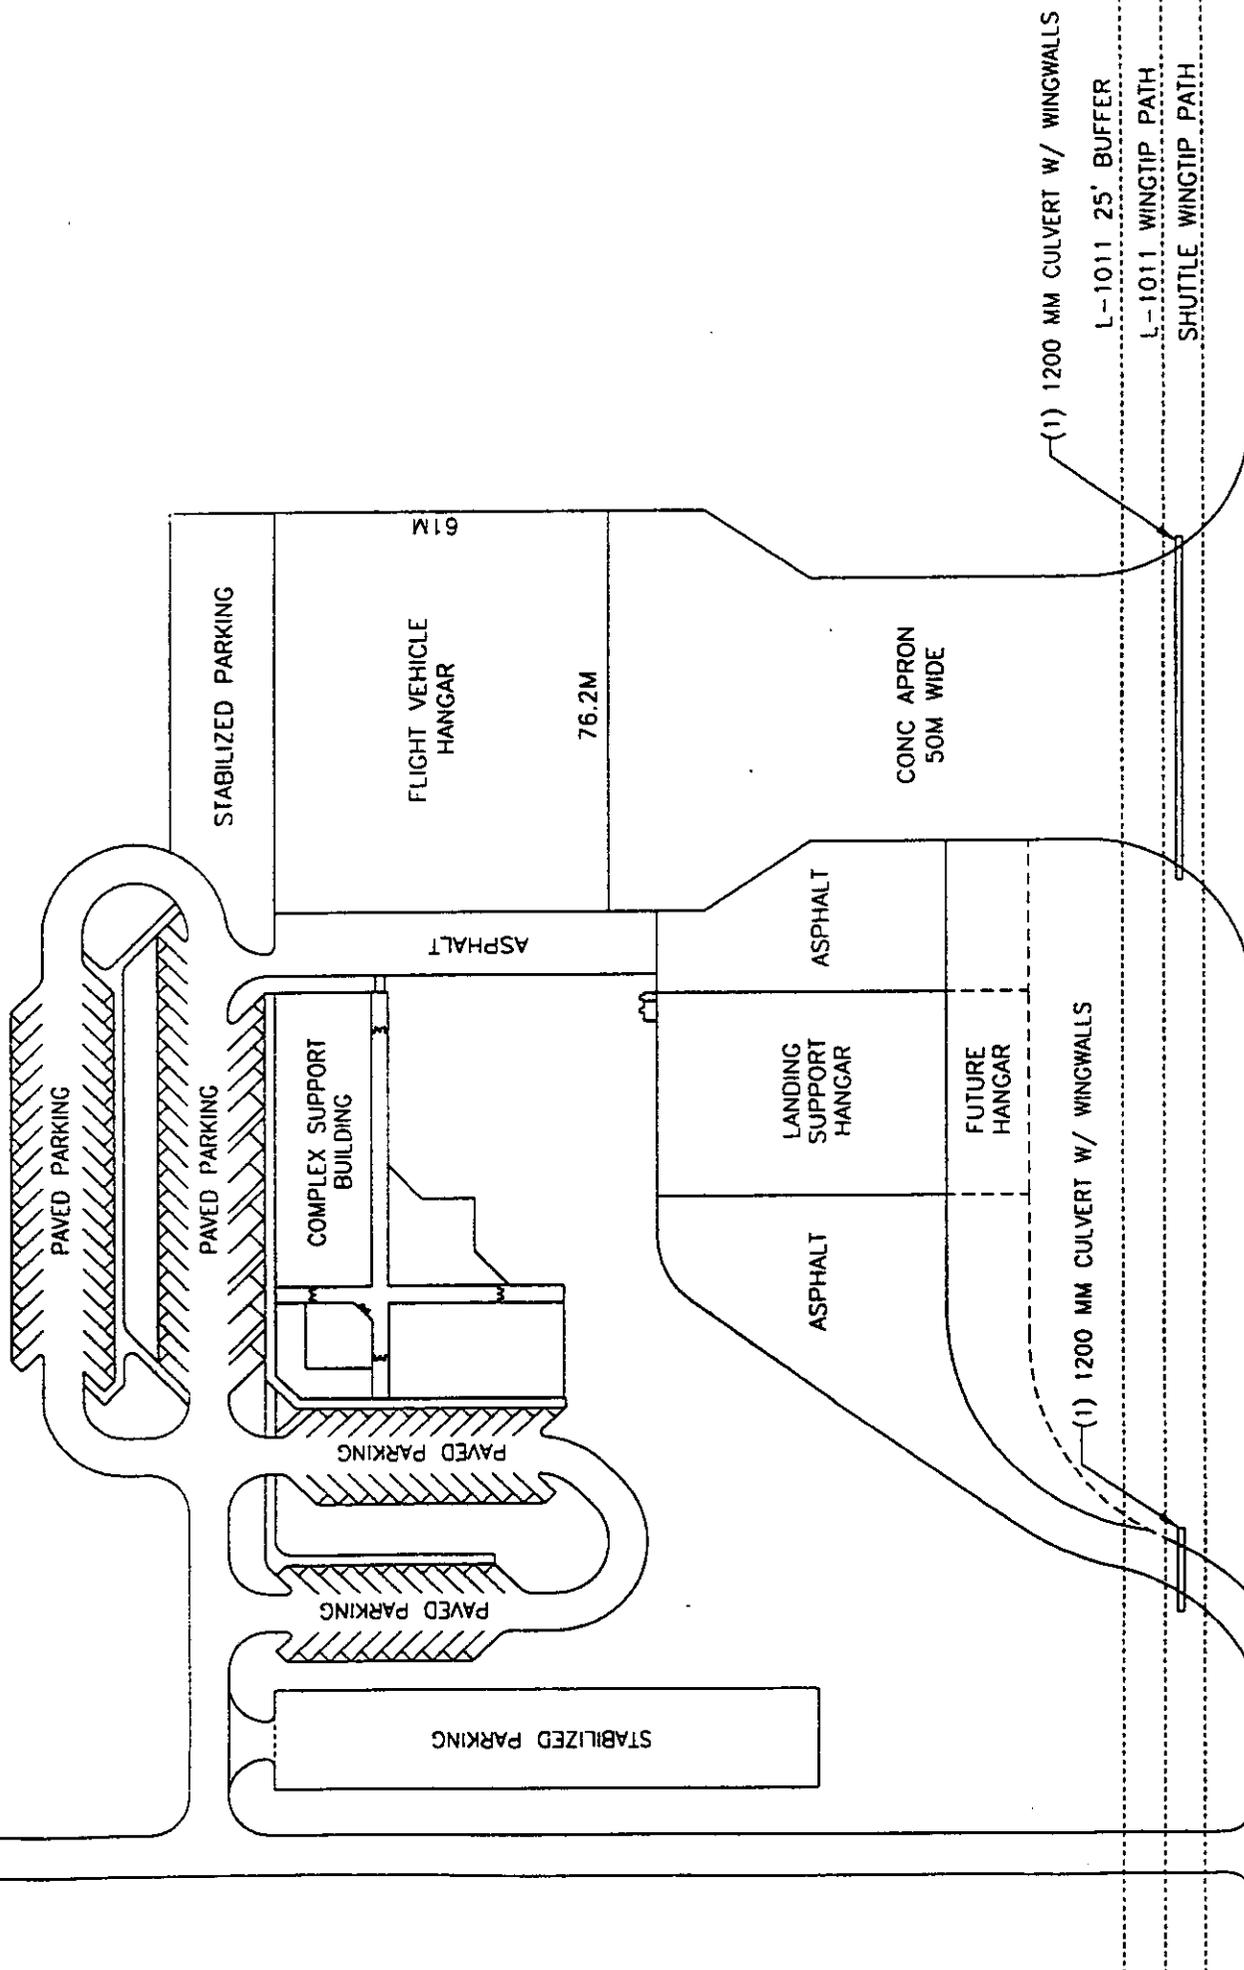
Site Plan of Proposed Flight Vehicle & Landing Support Complex (FVLSC)
